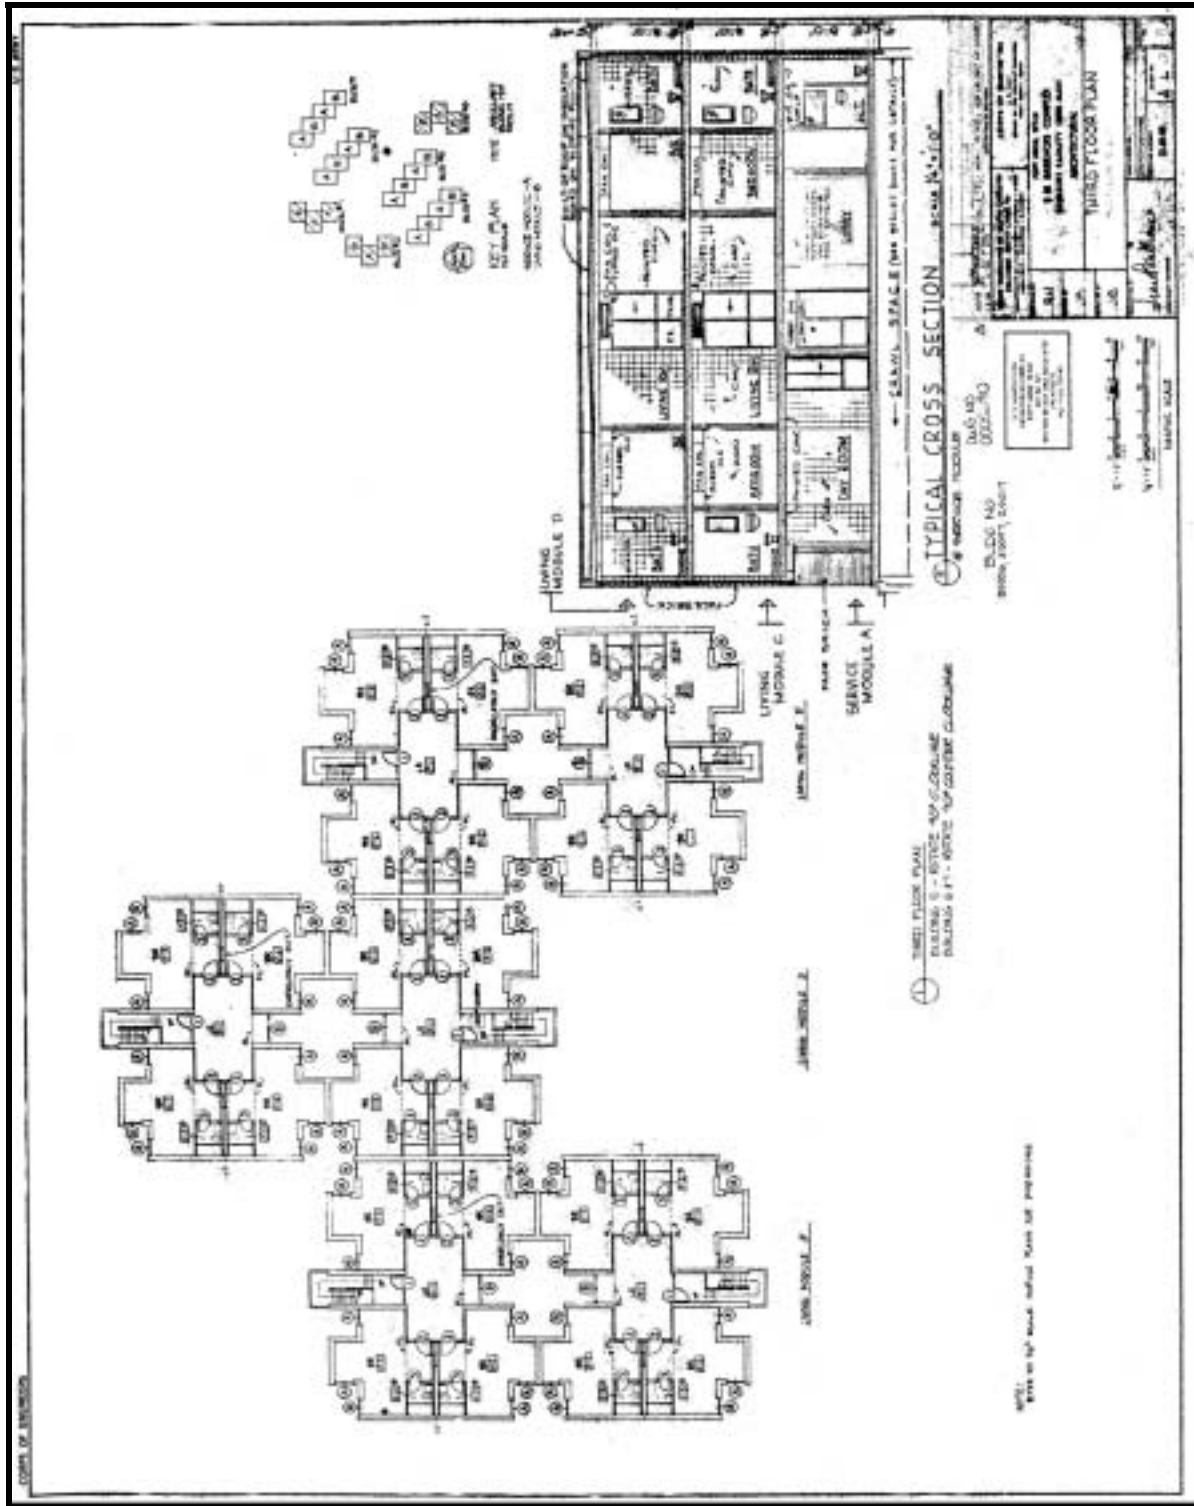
Three-building LBC&W barracks, third floor plan and typical cross section, Ft. Hood (1975, revised 1976) (Engineering, Ft. Hood).
